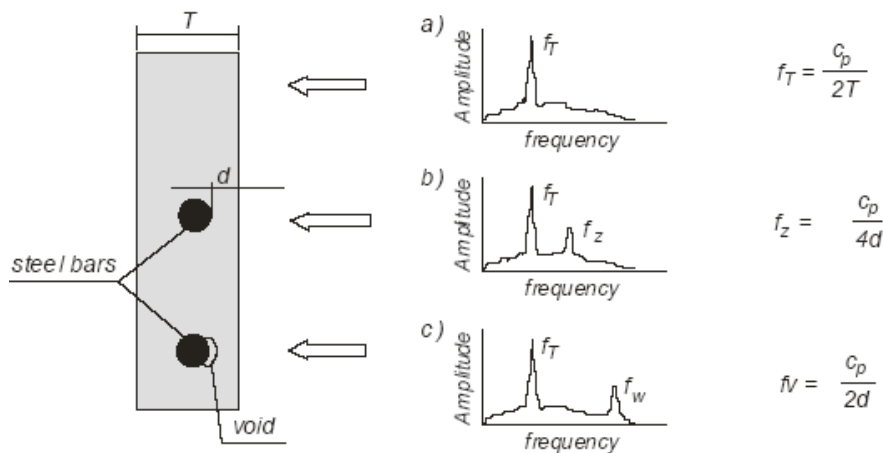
Scheme of steel bar localization with impact-echo method: a) place without reinforcement b) place with reinforcement, c) air void at the interface bar/concrete (Runkiewicz, 2002)
